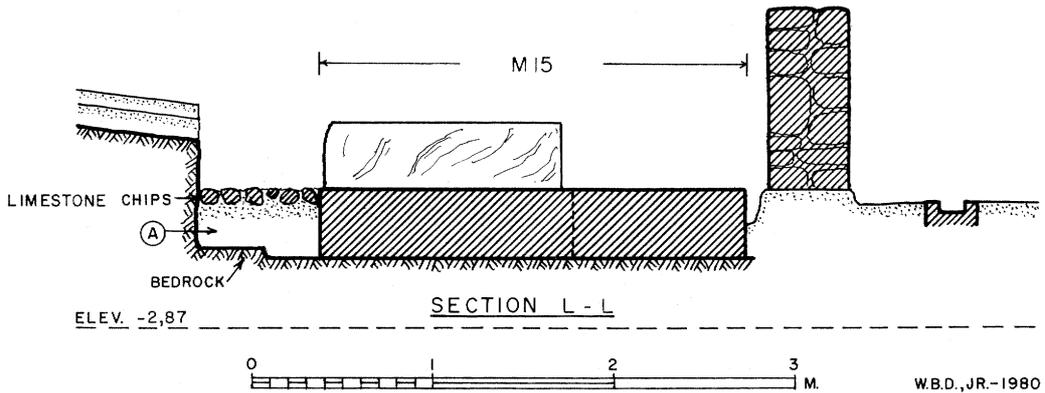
East Temenos, section L-L through monument base M¹⁵, looking northwest. At right, south wall of Roman Palaimonion III and stadium water channel (W. B. Dinsmoor Jr.)
